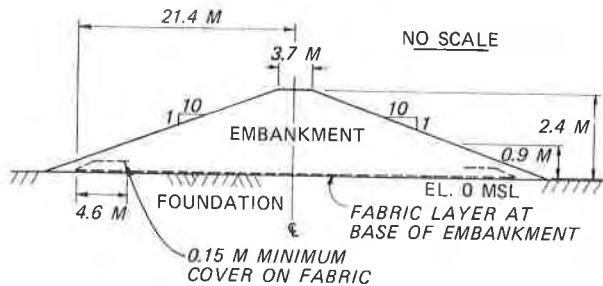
Simplified fabric-reinforced embankment section at Pinto Pass.
